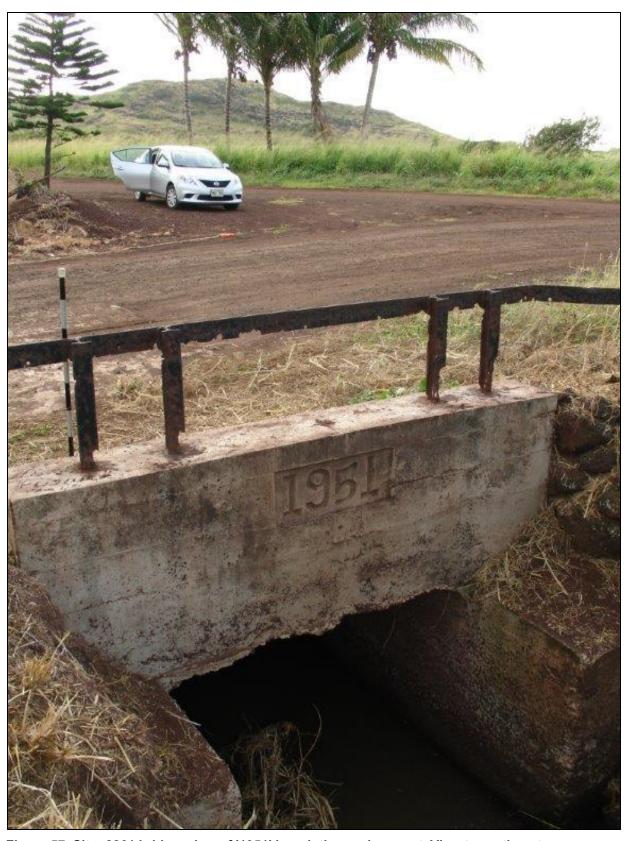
Site -2261 bridge, view of '1951' inscription and parapet. View to northeast.
